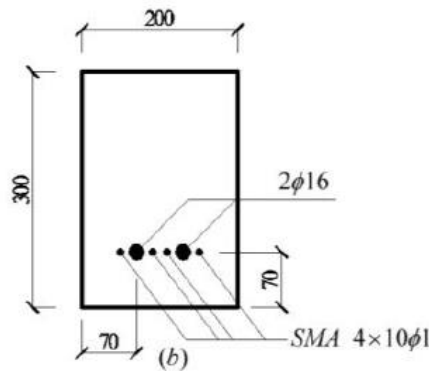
Hybrid SMA-Steel reinforced concrete beam (Wong et al. 2014)
